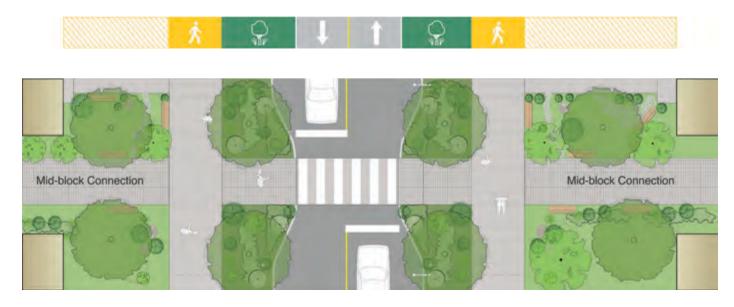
Plan of Balliol Green Street - Recommended Final Condition of bump-out and raised pedestrian crossing at mid-block connection
